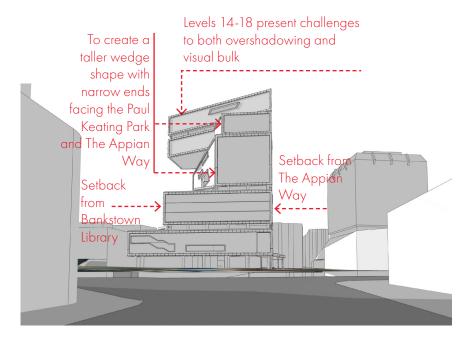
Building Setback - The Appian Way Street View (Source: Tract 2019)
